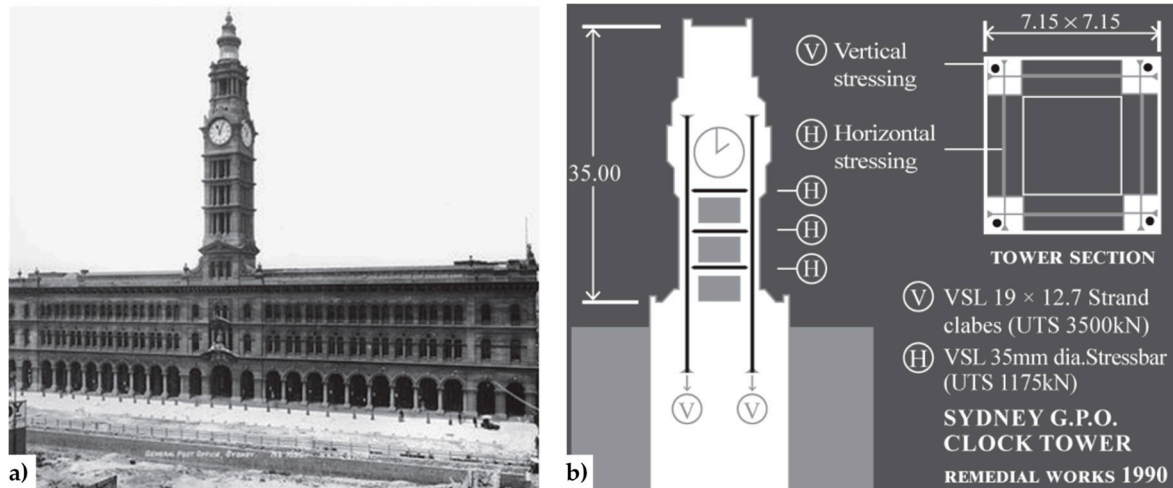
a) The GPO Tower (Sydney, Australia); b) Strengthening of GPO Tower with internal horizontal and vertical tie-bars [4].
